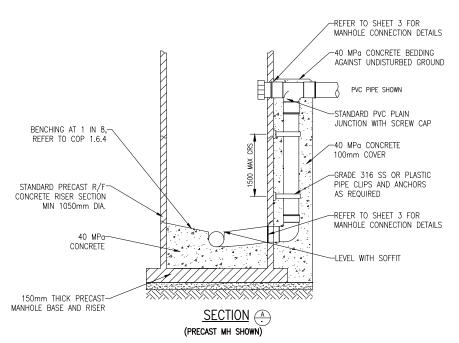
B(a) TYPICAL INTERNAL DROP MANHOLE - POST CONSTRUCTION INSTALLATION DETAIL (ONLY TO BE USED WHEN DIRECTED BY ENGINEER)
